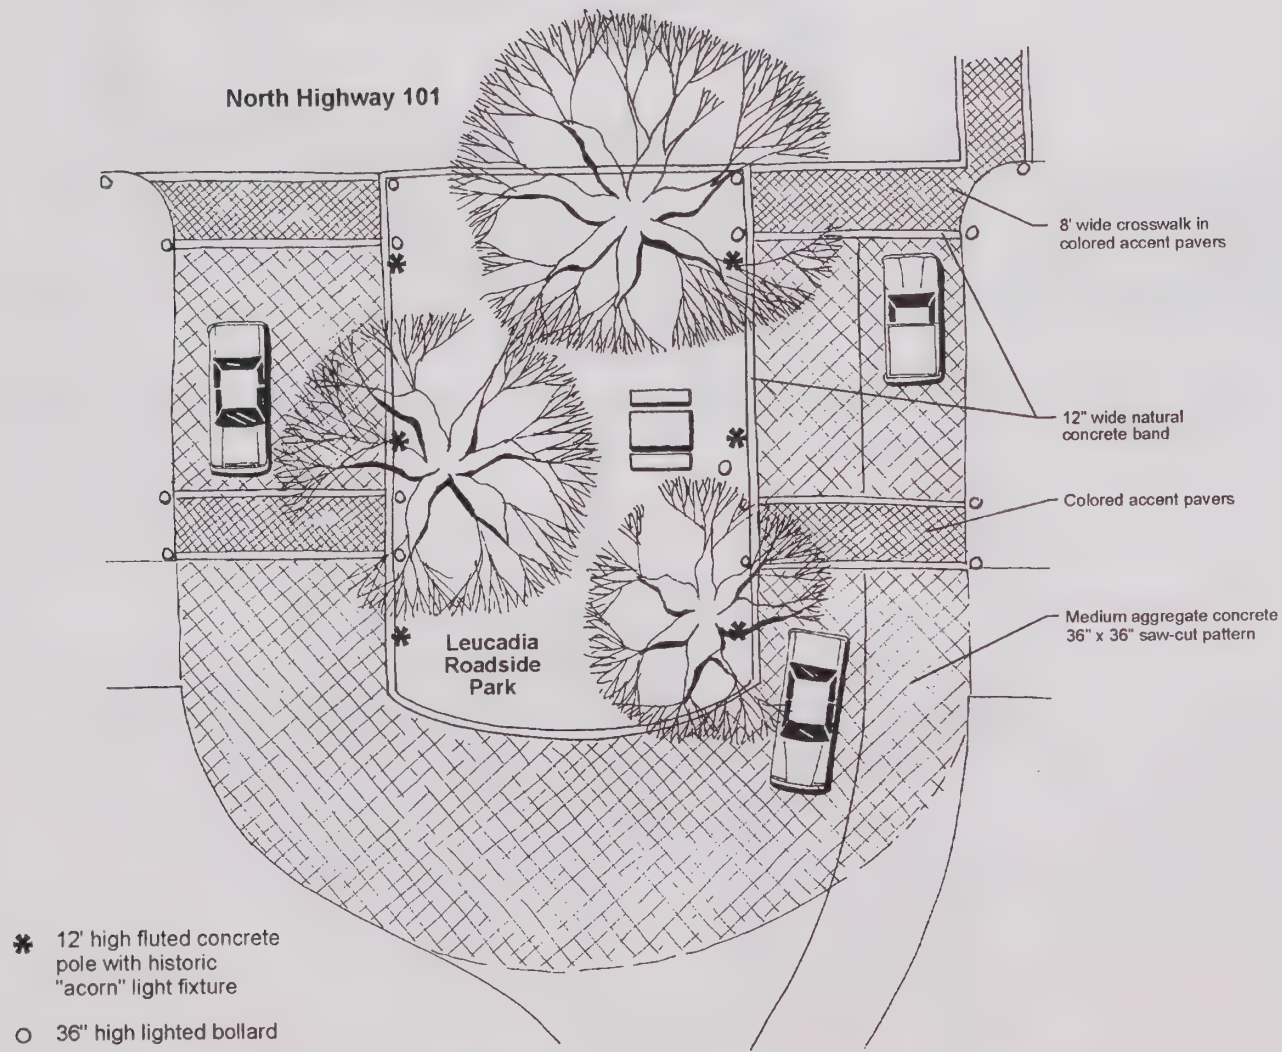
F: Leucadia Boulevard/North Highway 101/North Vulcan Avenue Intersection Concept
